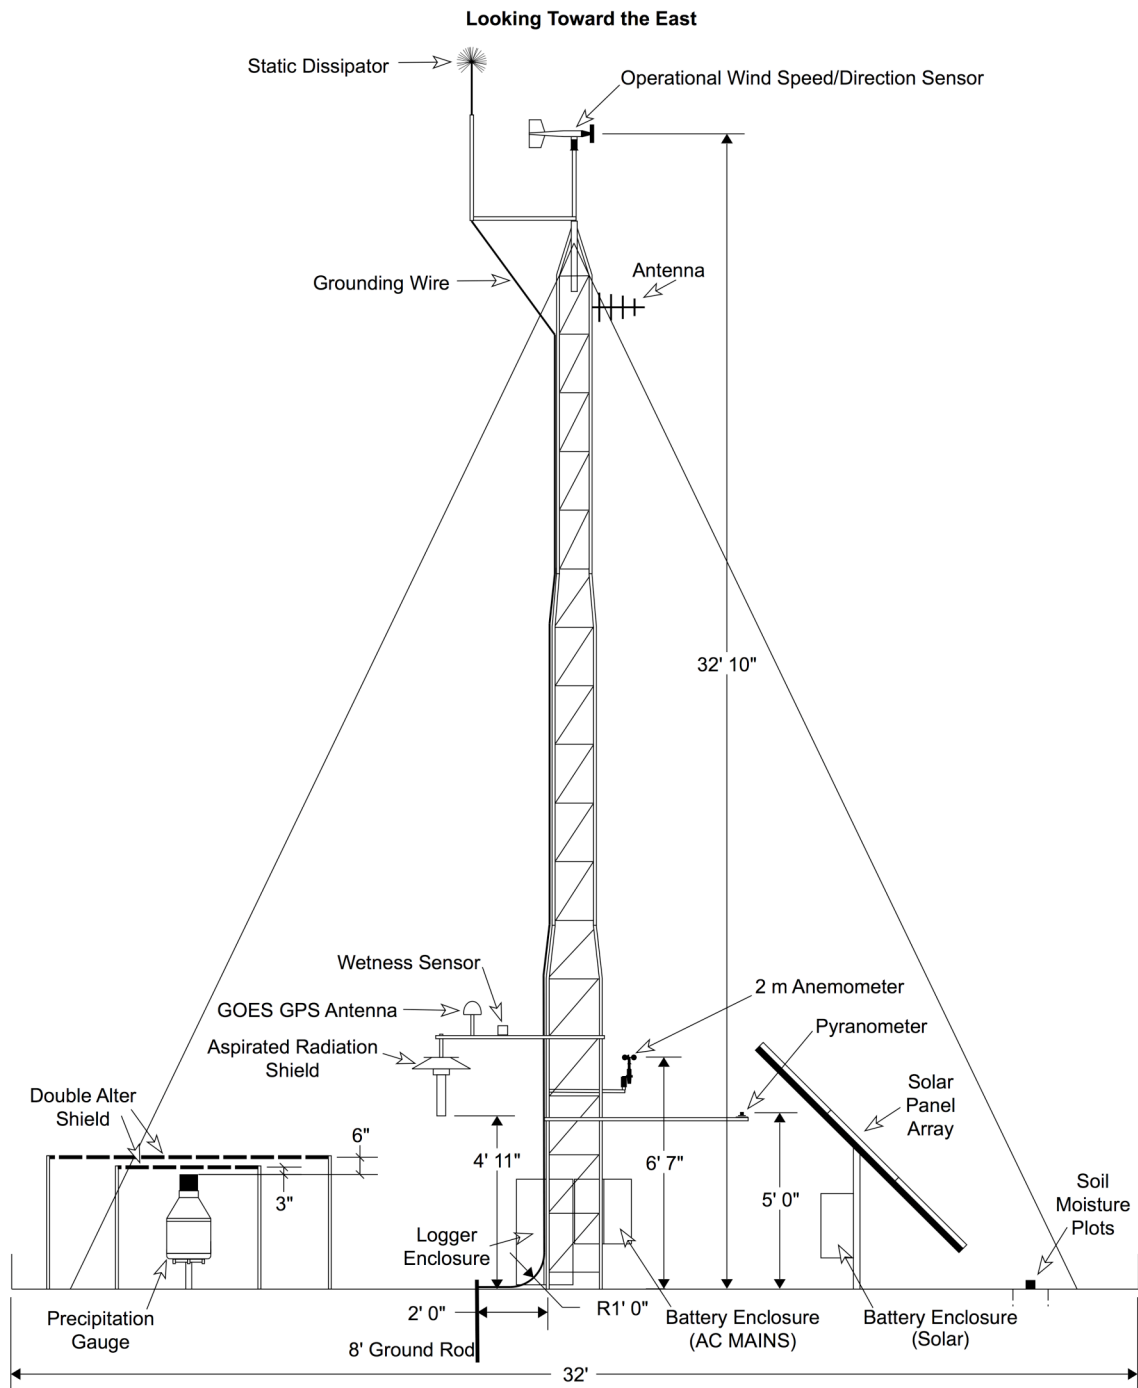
Profile view of a station plot that measures 32-by-32 feet and has a tall tower.
